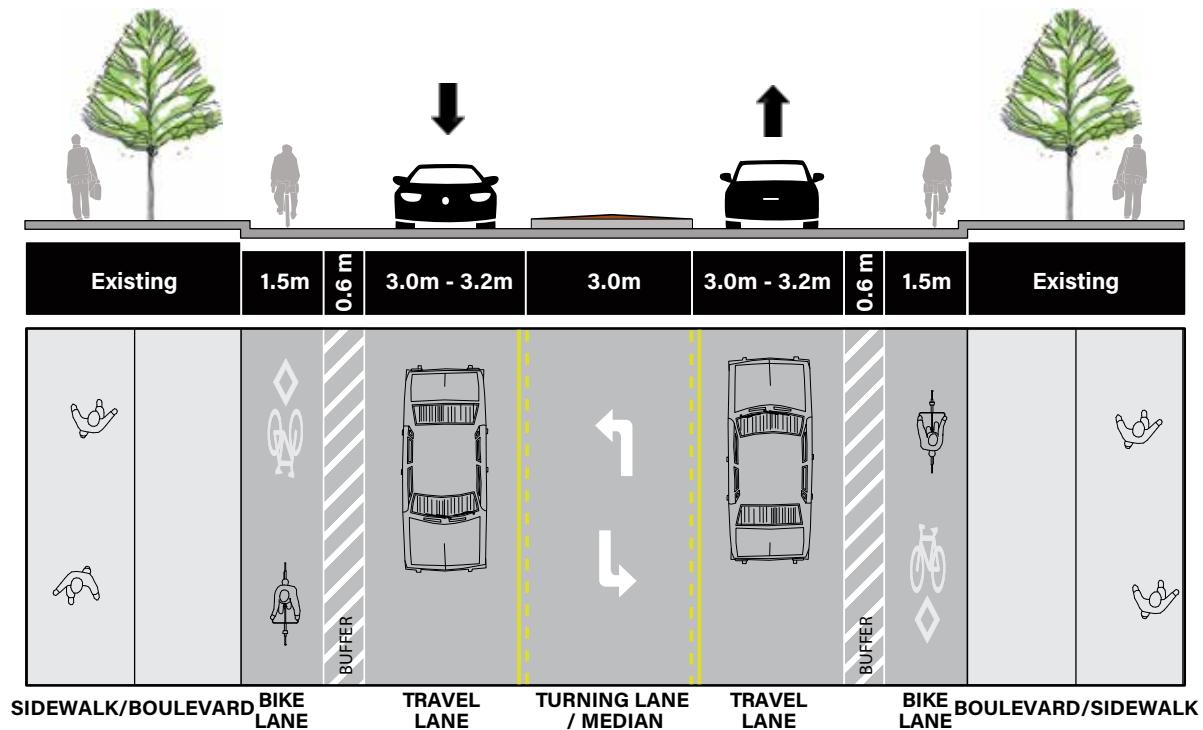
| Typical Short-term/ Existing Shelbourne Street Cross-Section
